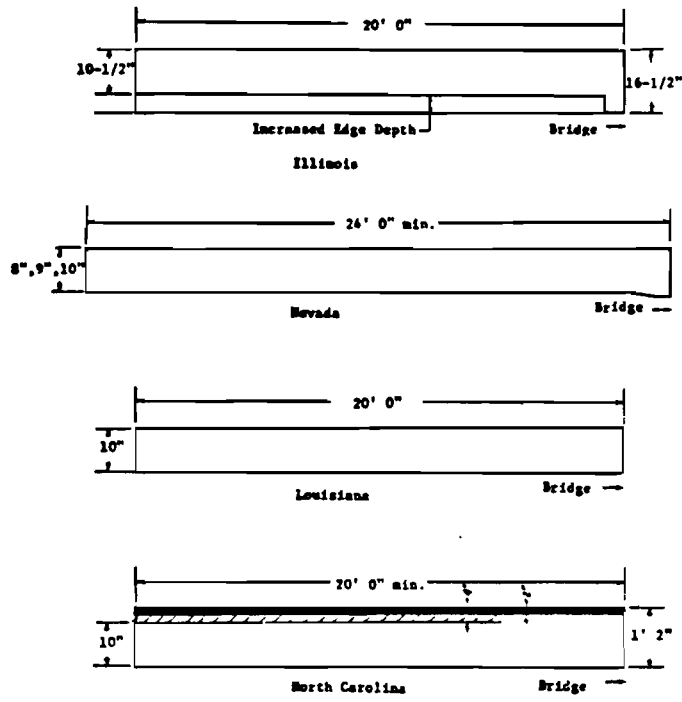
Commonly used bridge approach slabs (from Ref 2).
